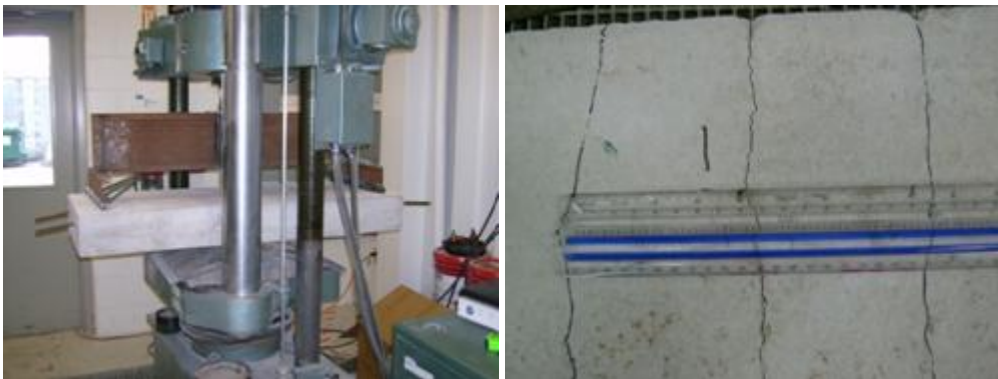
Construction of Test Slabs and Placement of Blades for Crack Width
